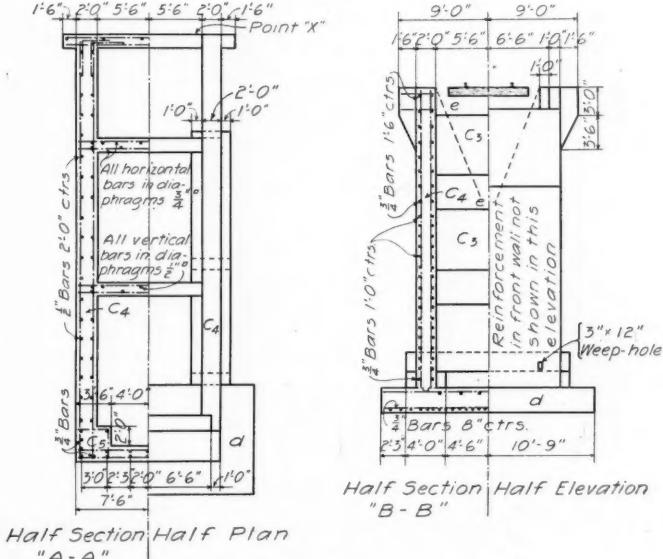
Type C₂; Reinforced Concrete U Abutment Filled; Long Sidewalls.
